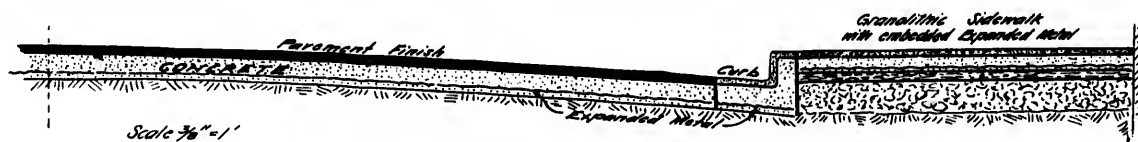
EXPANDED METAL IN ROADWAYS AND SIDEWALKS.
